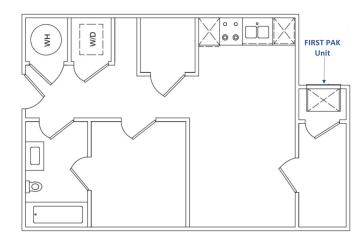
Typical Floorplan with FIRST-PAK on Exterior Wall
